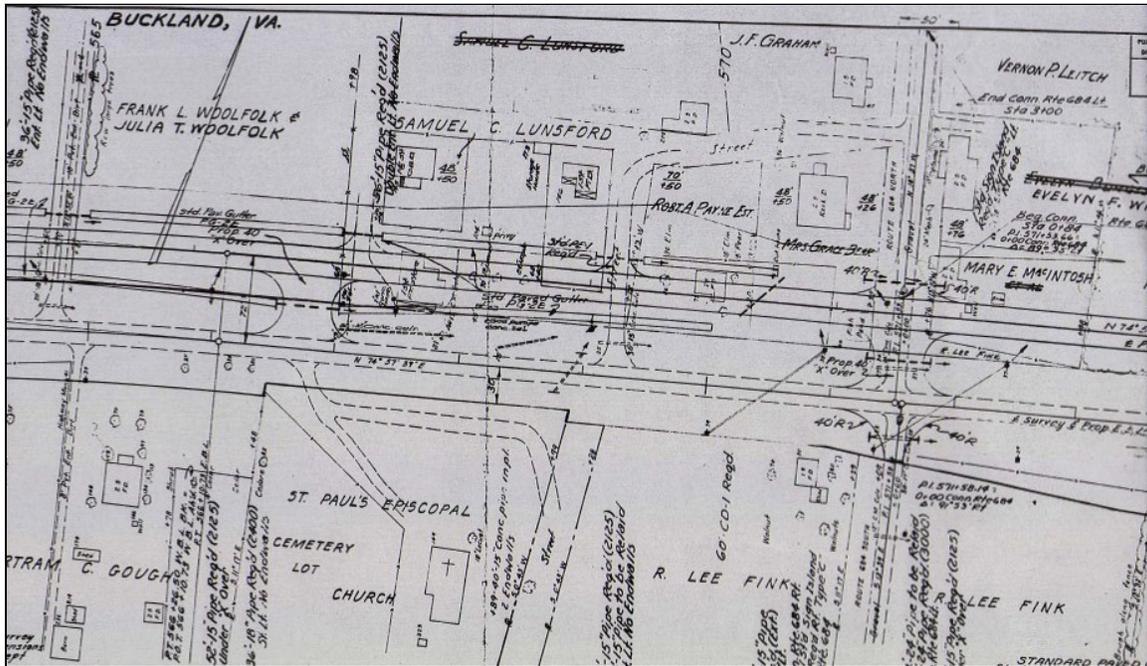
Detail, plan for widening Route 29, showing proposed expansion and condemnation of properties to the north of existing road. Virginia Department of Highways, 1952.
